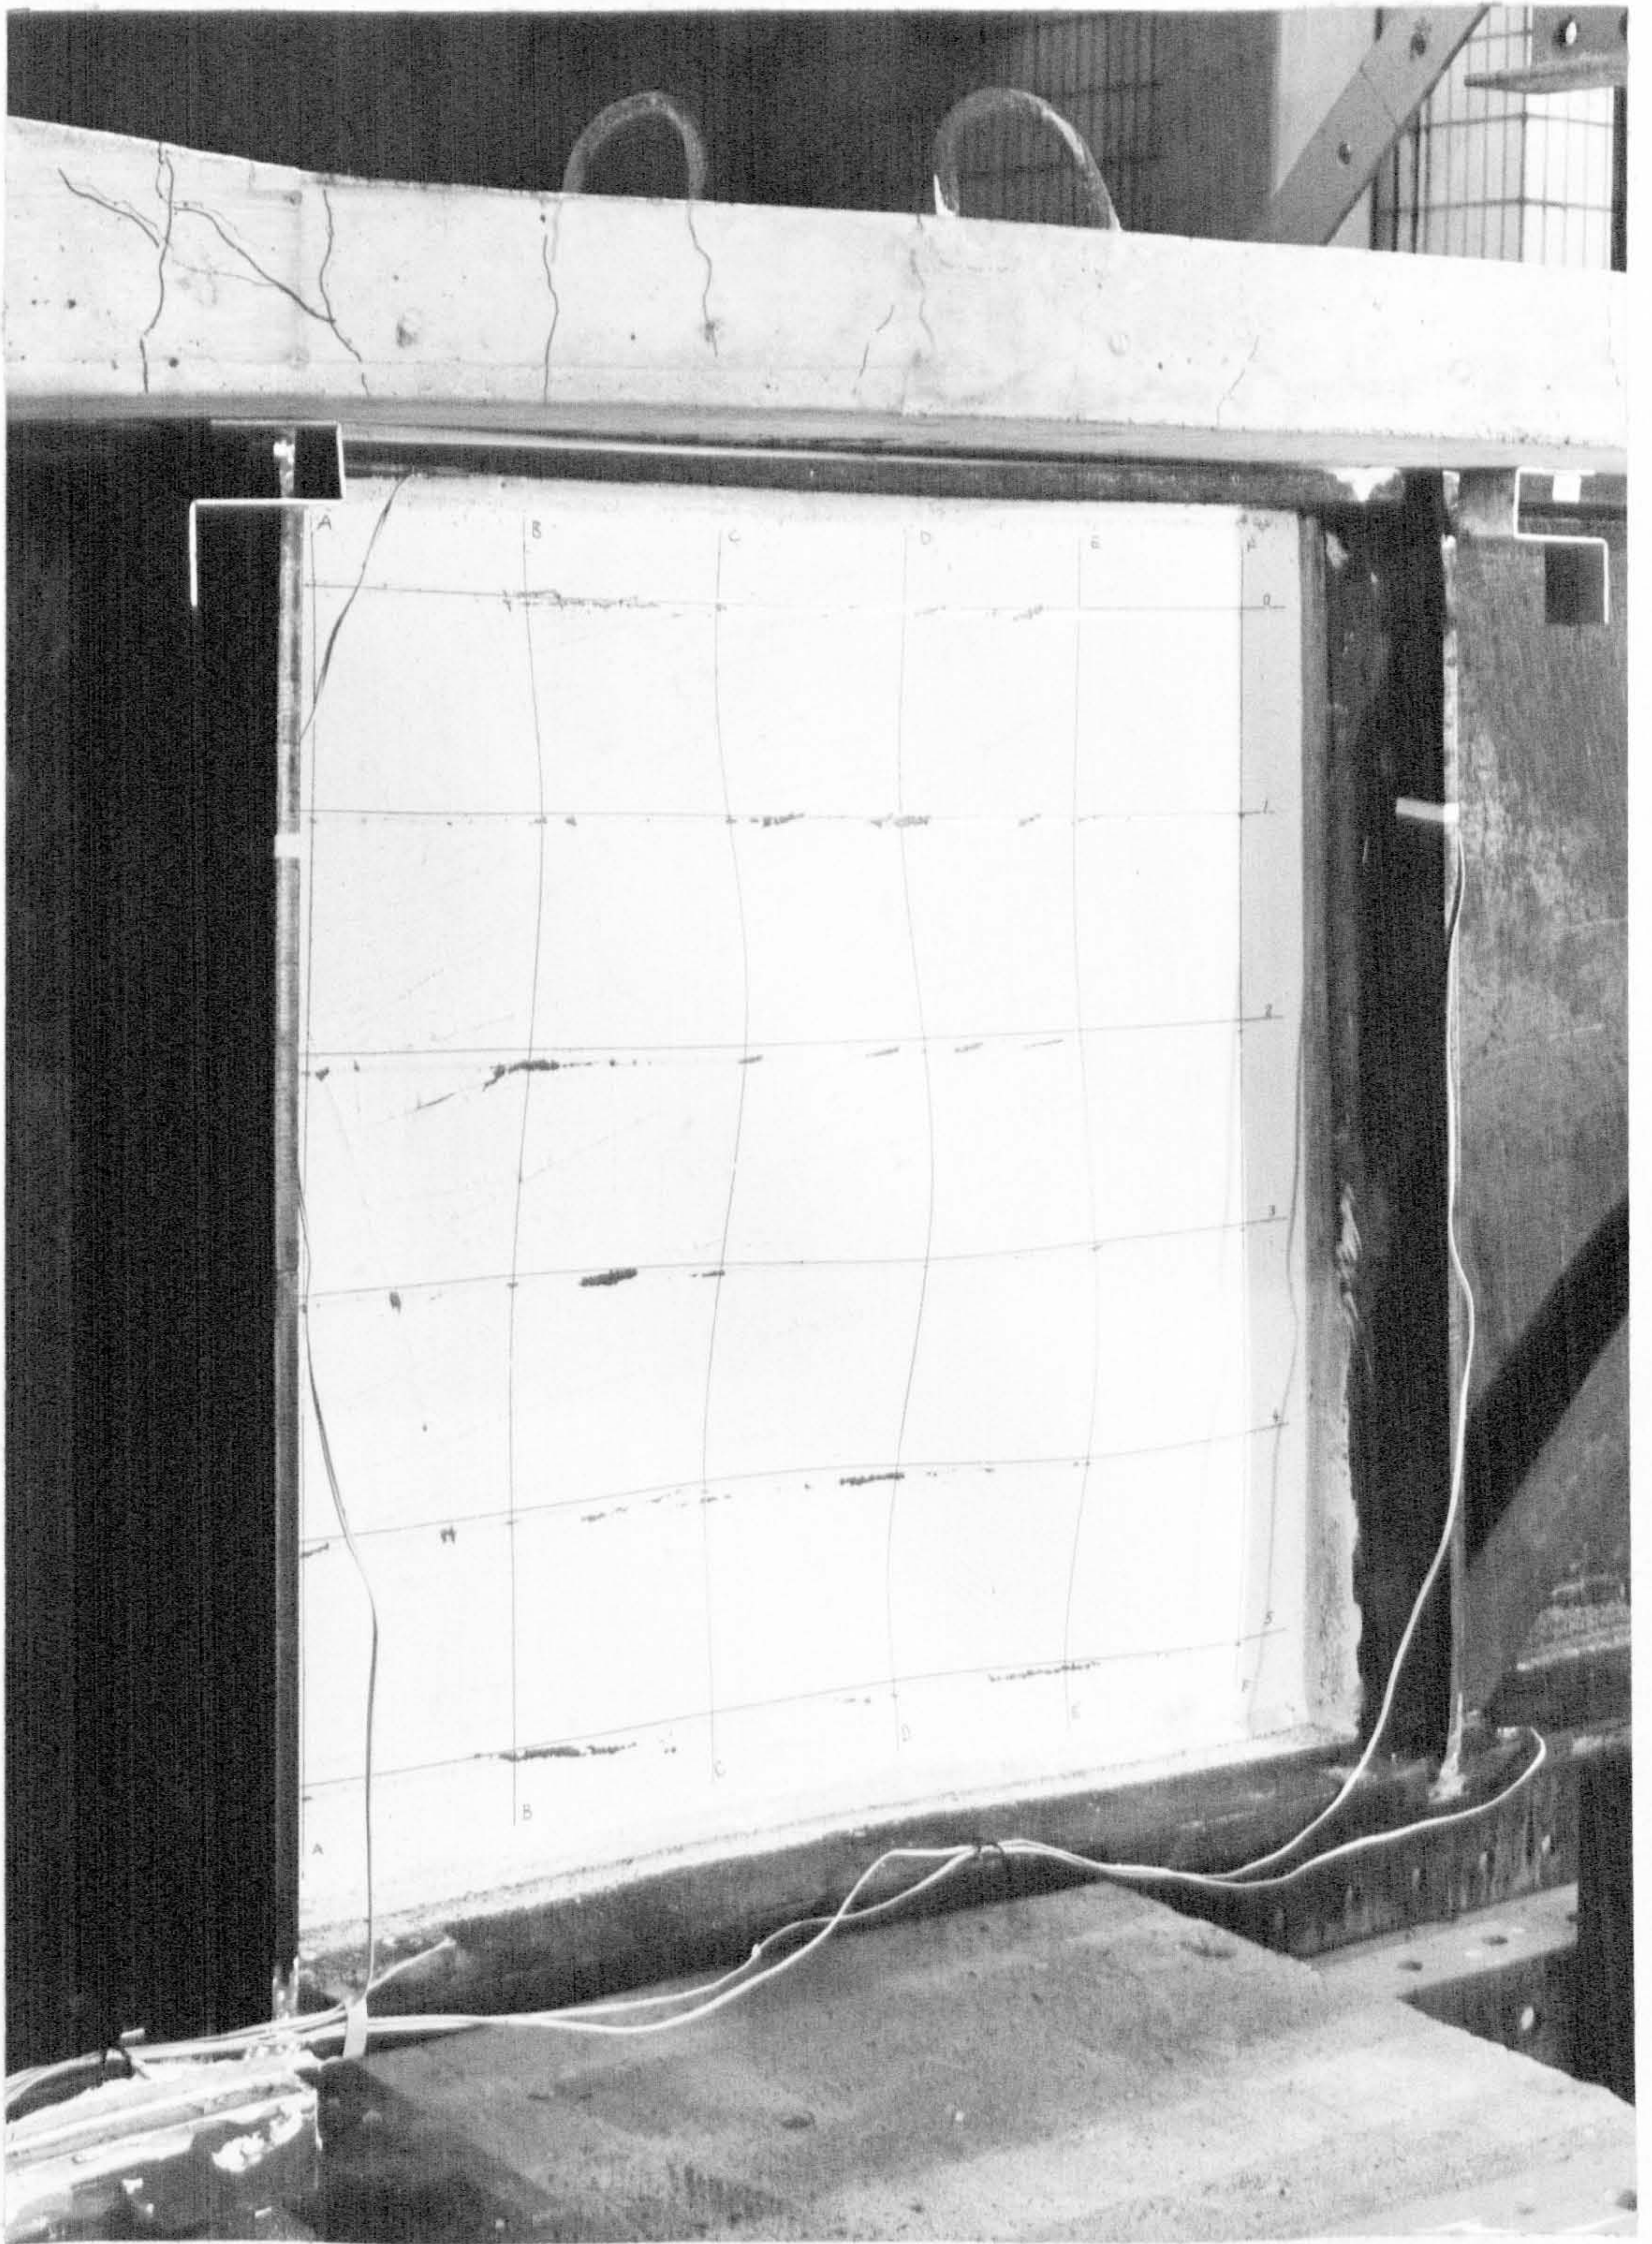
SEPARATION OF SLAB AND GIRDER IN BEAM PG2A
